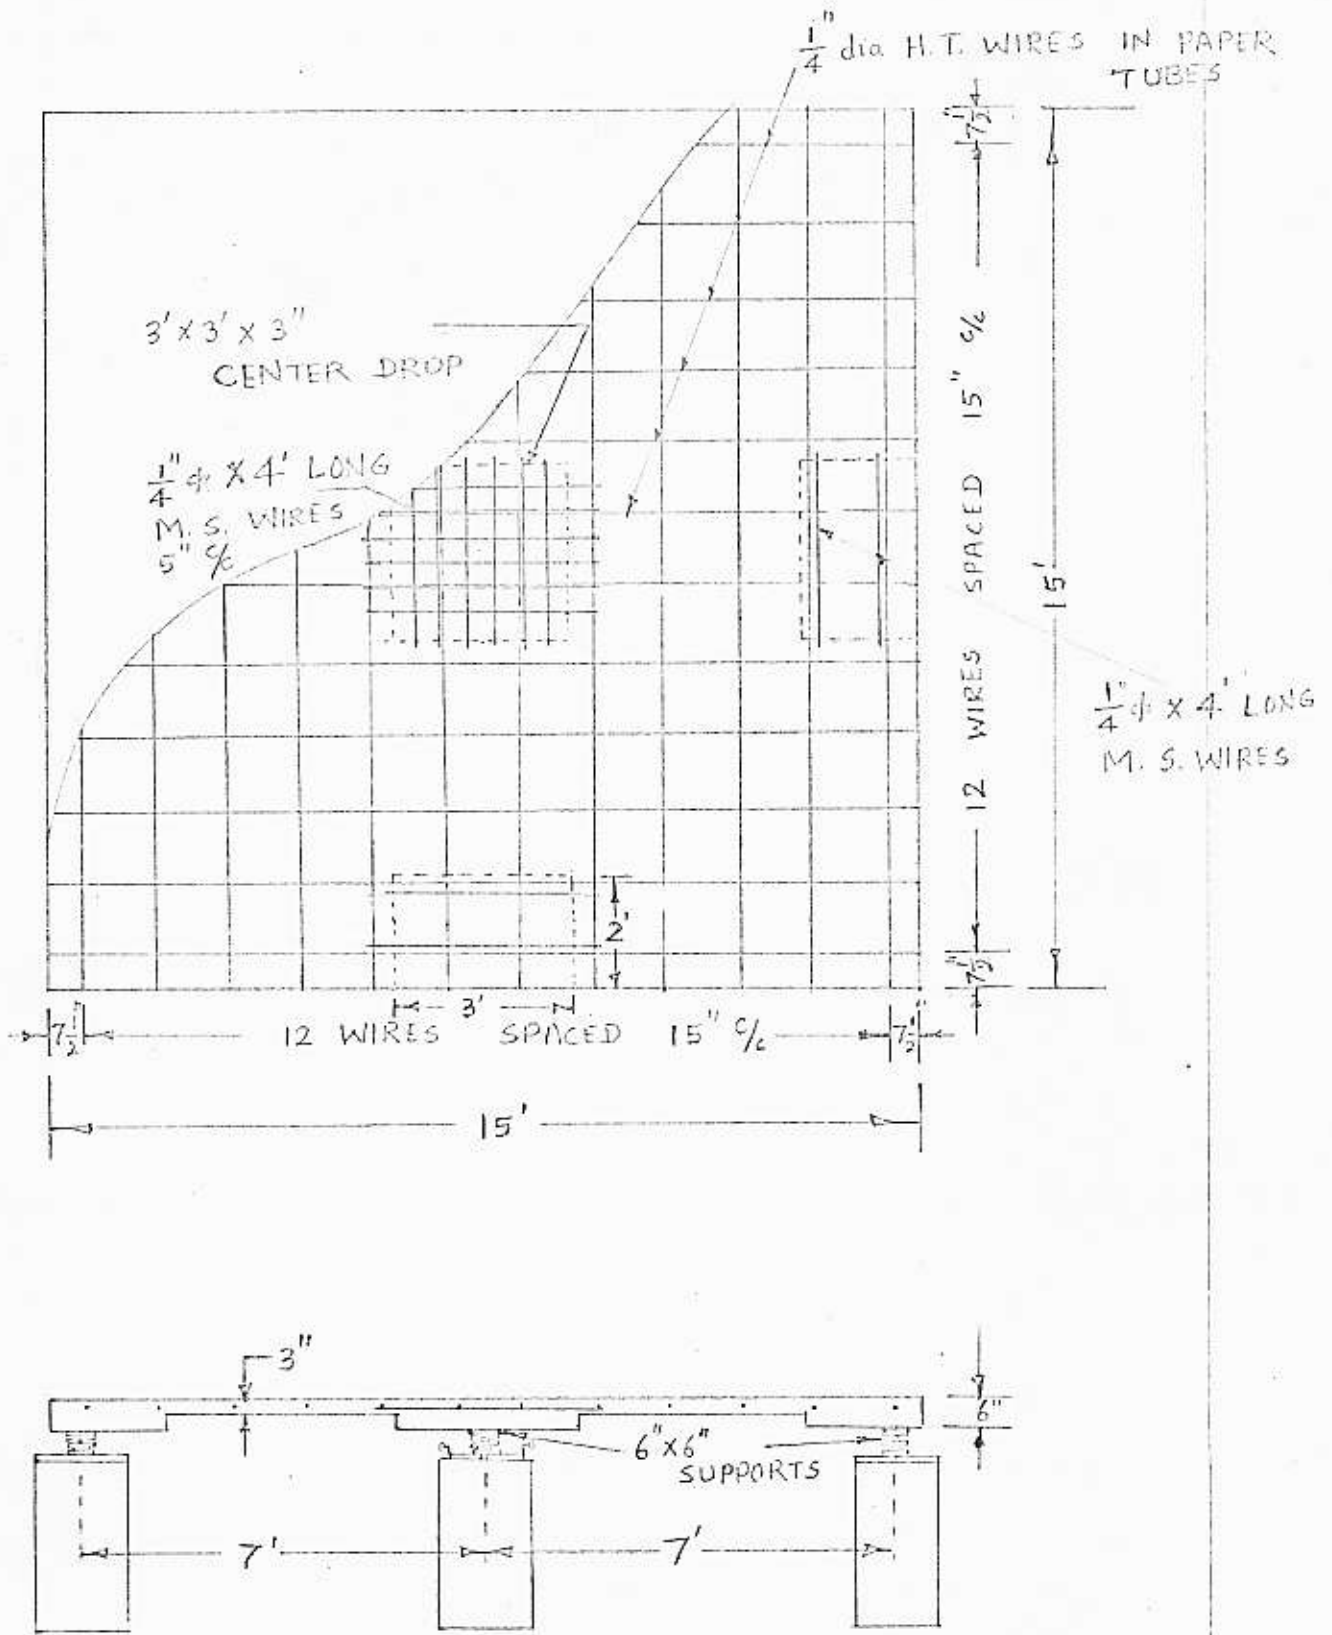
PLAN AND ELEVATION OF SLAB SHOWING STEEL ARRANGEMENT
